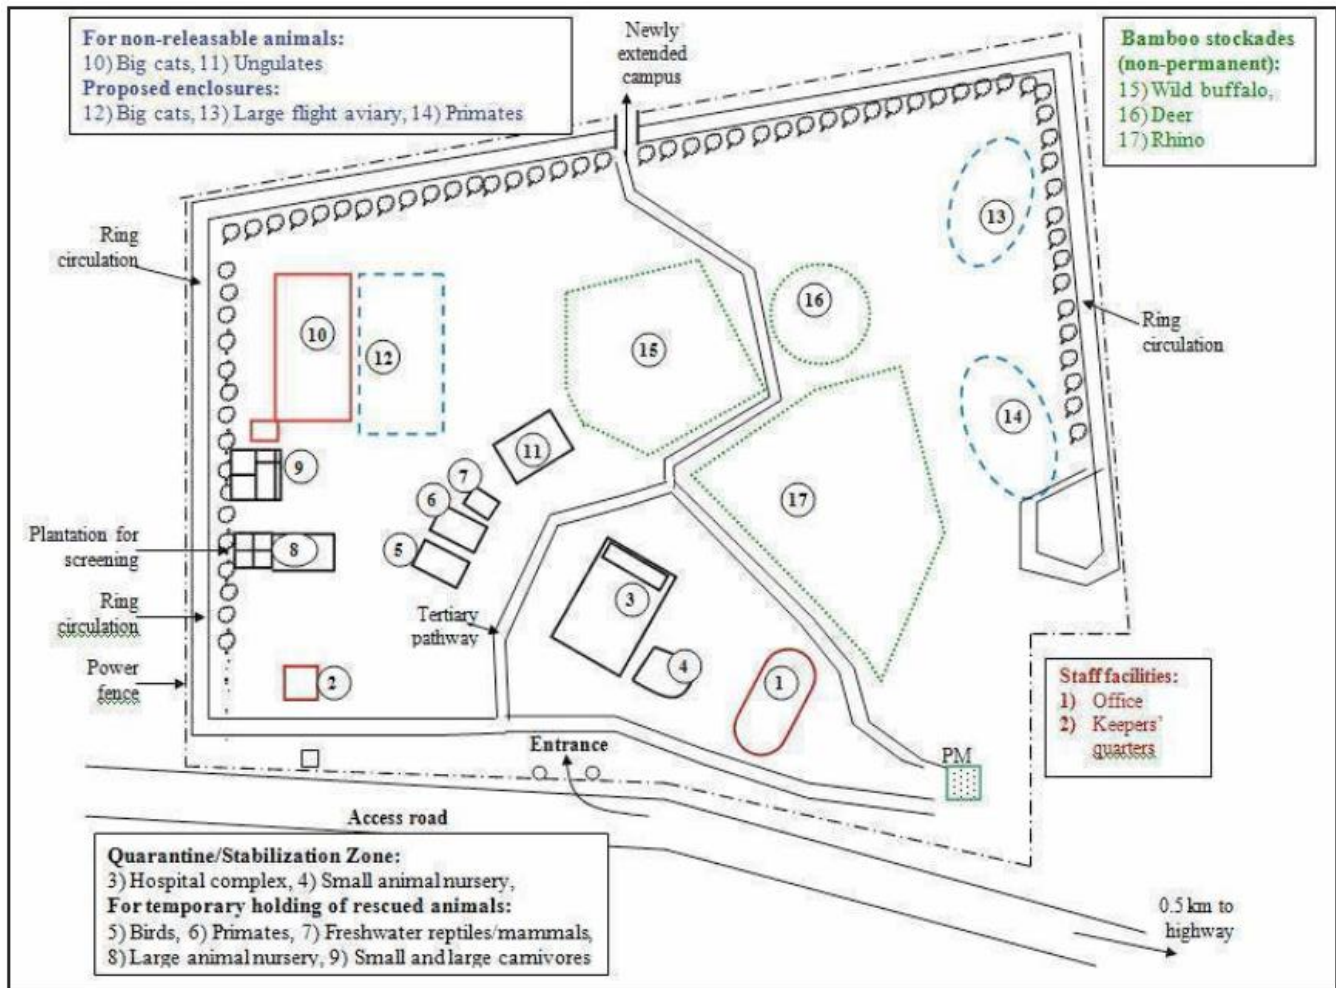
Current layout of all facilities in Zone-A. Dotted lines indicate the new facilities being planned
